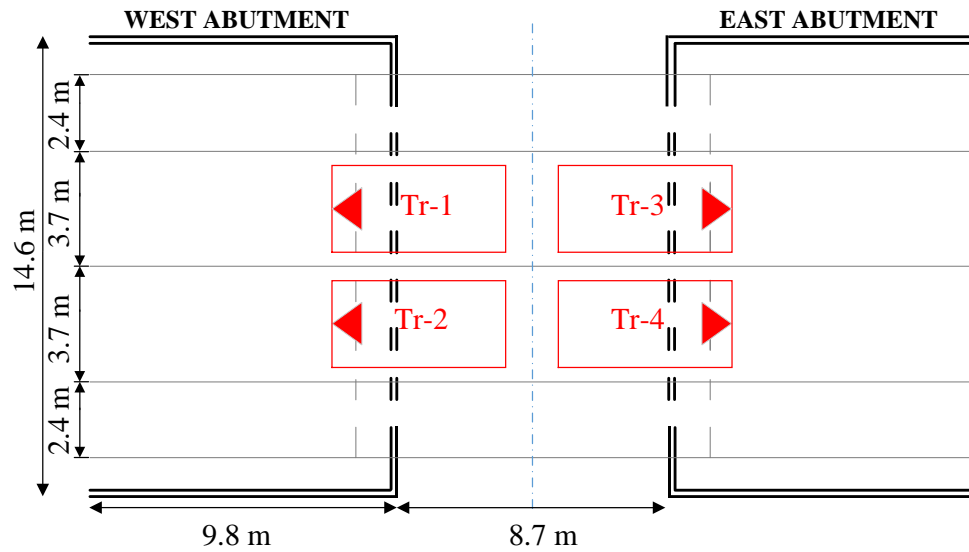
Live load test, truck position number 8 (P8) – four trucks, facing both east and west. Used for Live Load Test No. 15.
